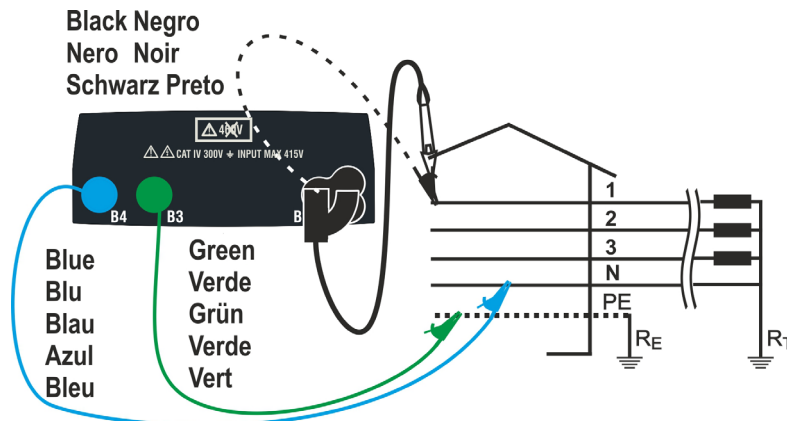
P-N/P-PE test for 400V+N+PE three-phase with single cables and remote probe
